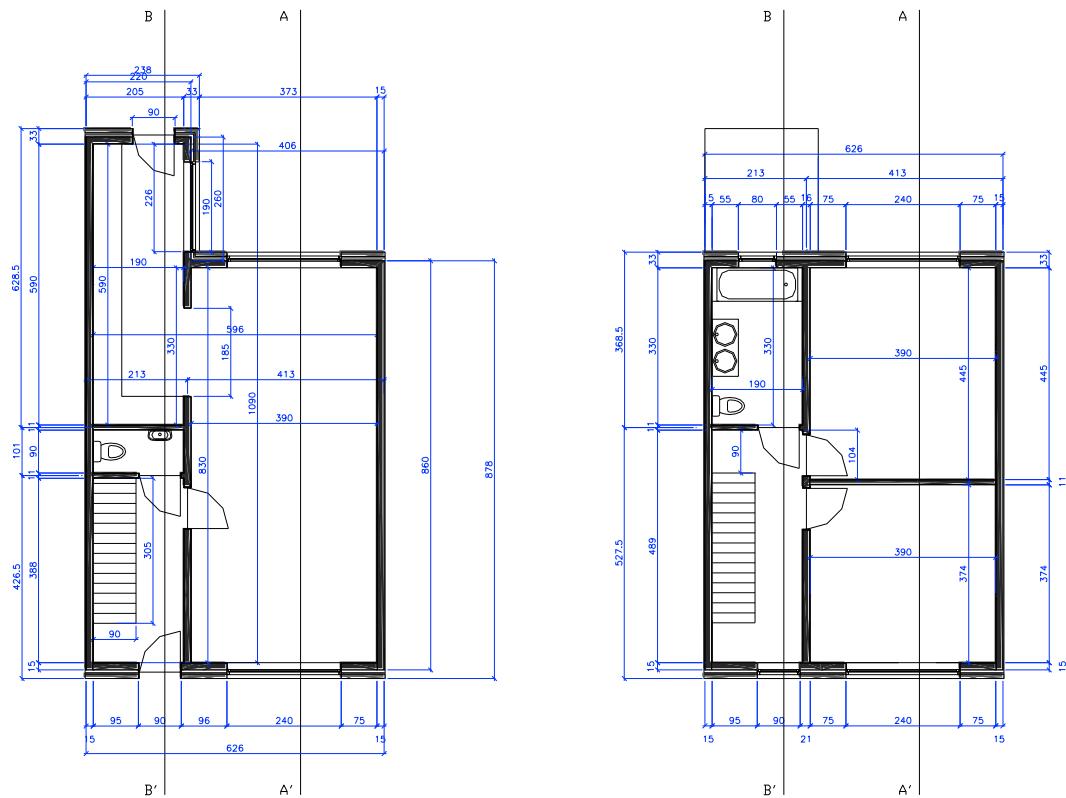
Terraced house: Ground floor plan (left) and 1st floor plan (right)
